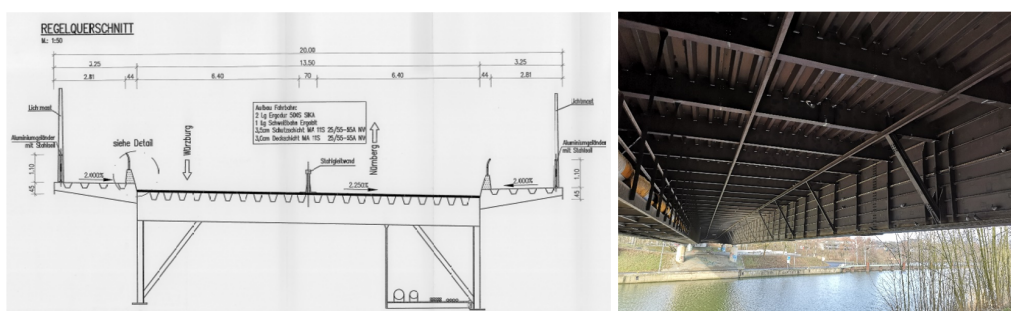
Cross section of the Heinrich's bridge (left: extract from plan, right: photo under the bridge) [14].
